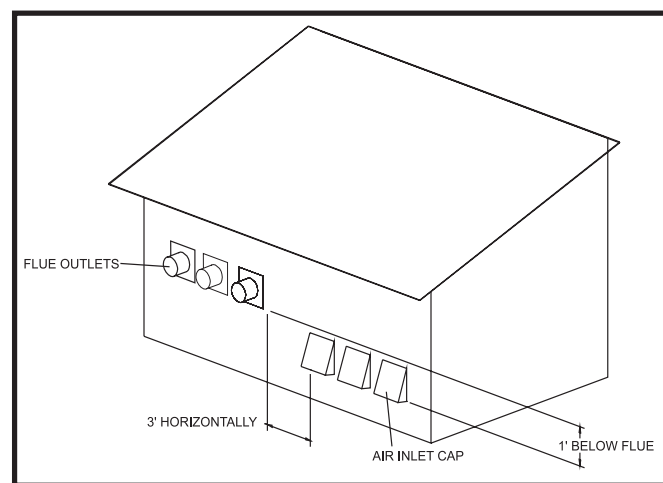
Multiple Horizontal Direct Vent Caps Installed on a Sidewall
